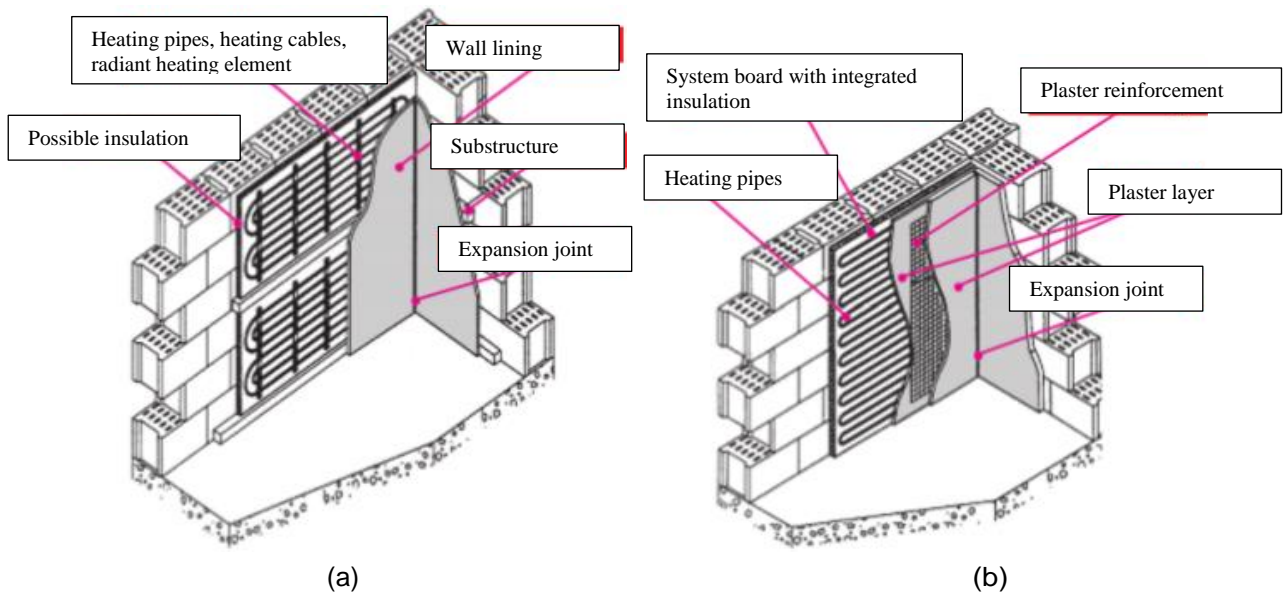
(a) Wall heating with installation of heating pipes directly on the wall;
